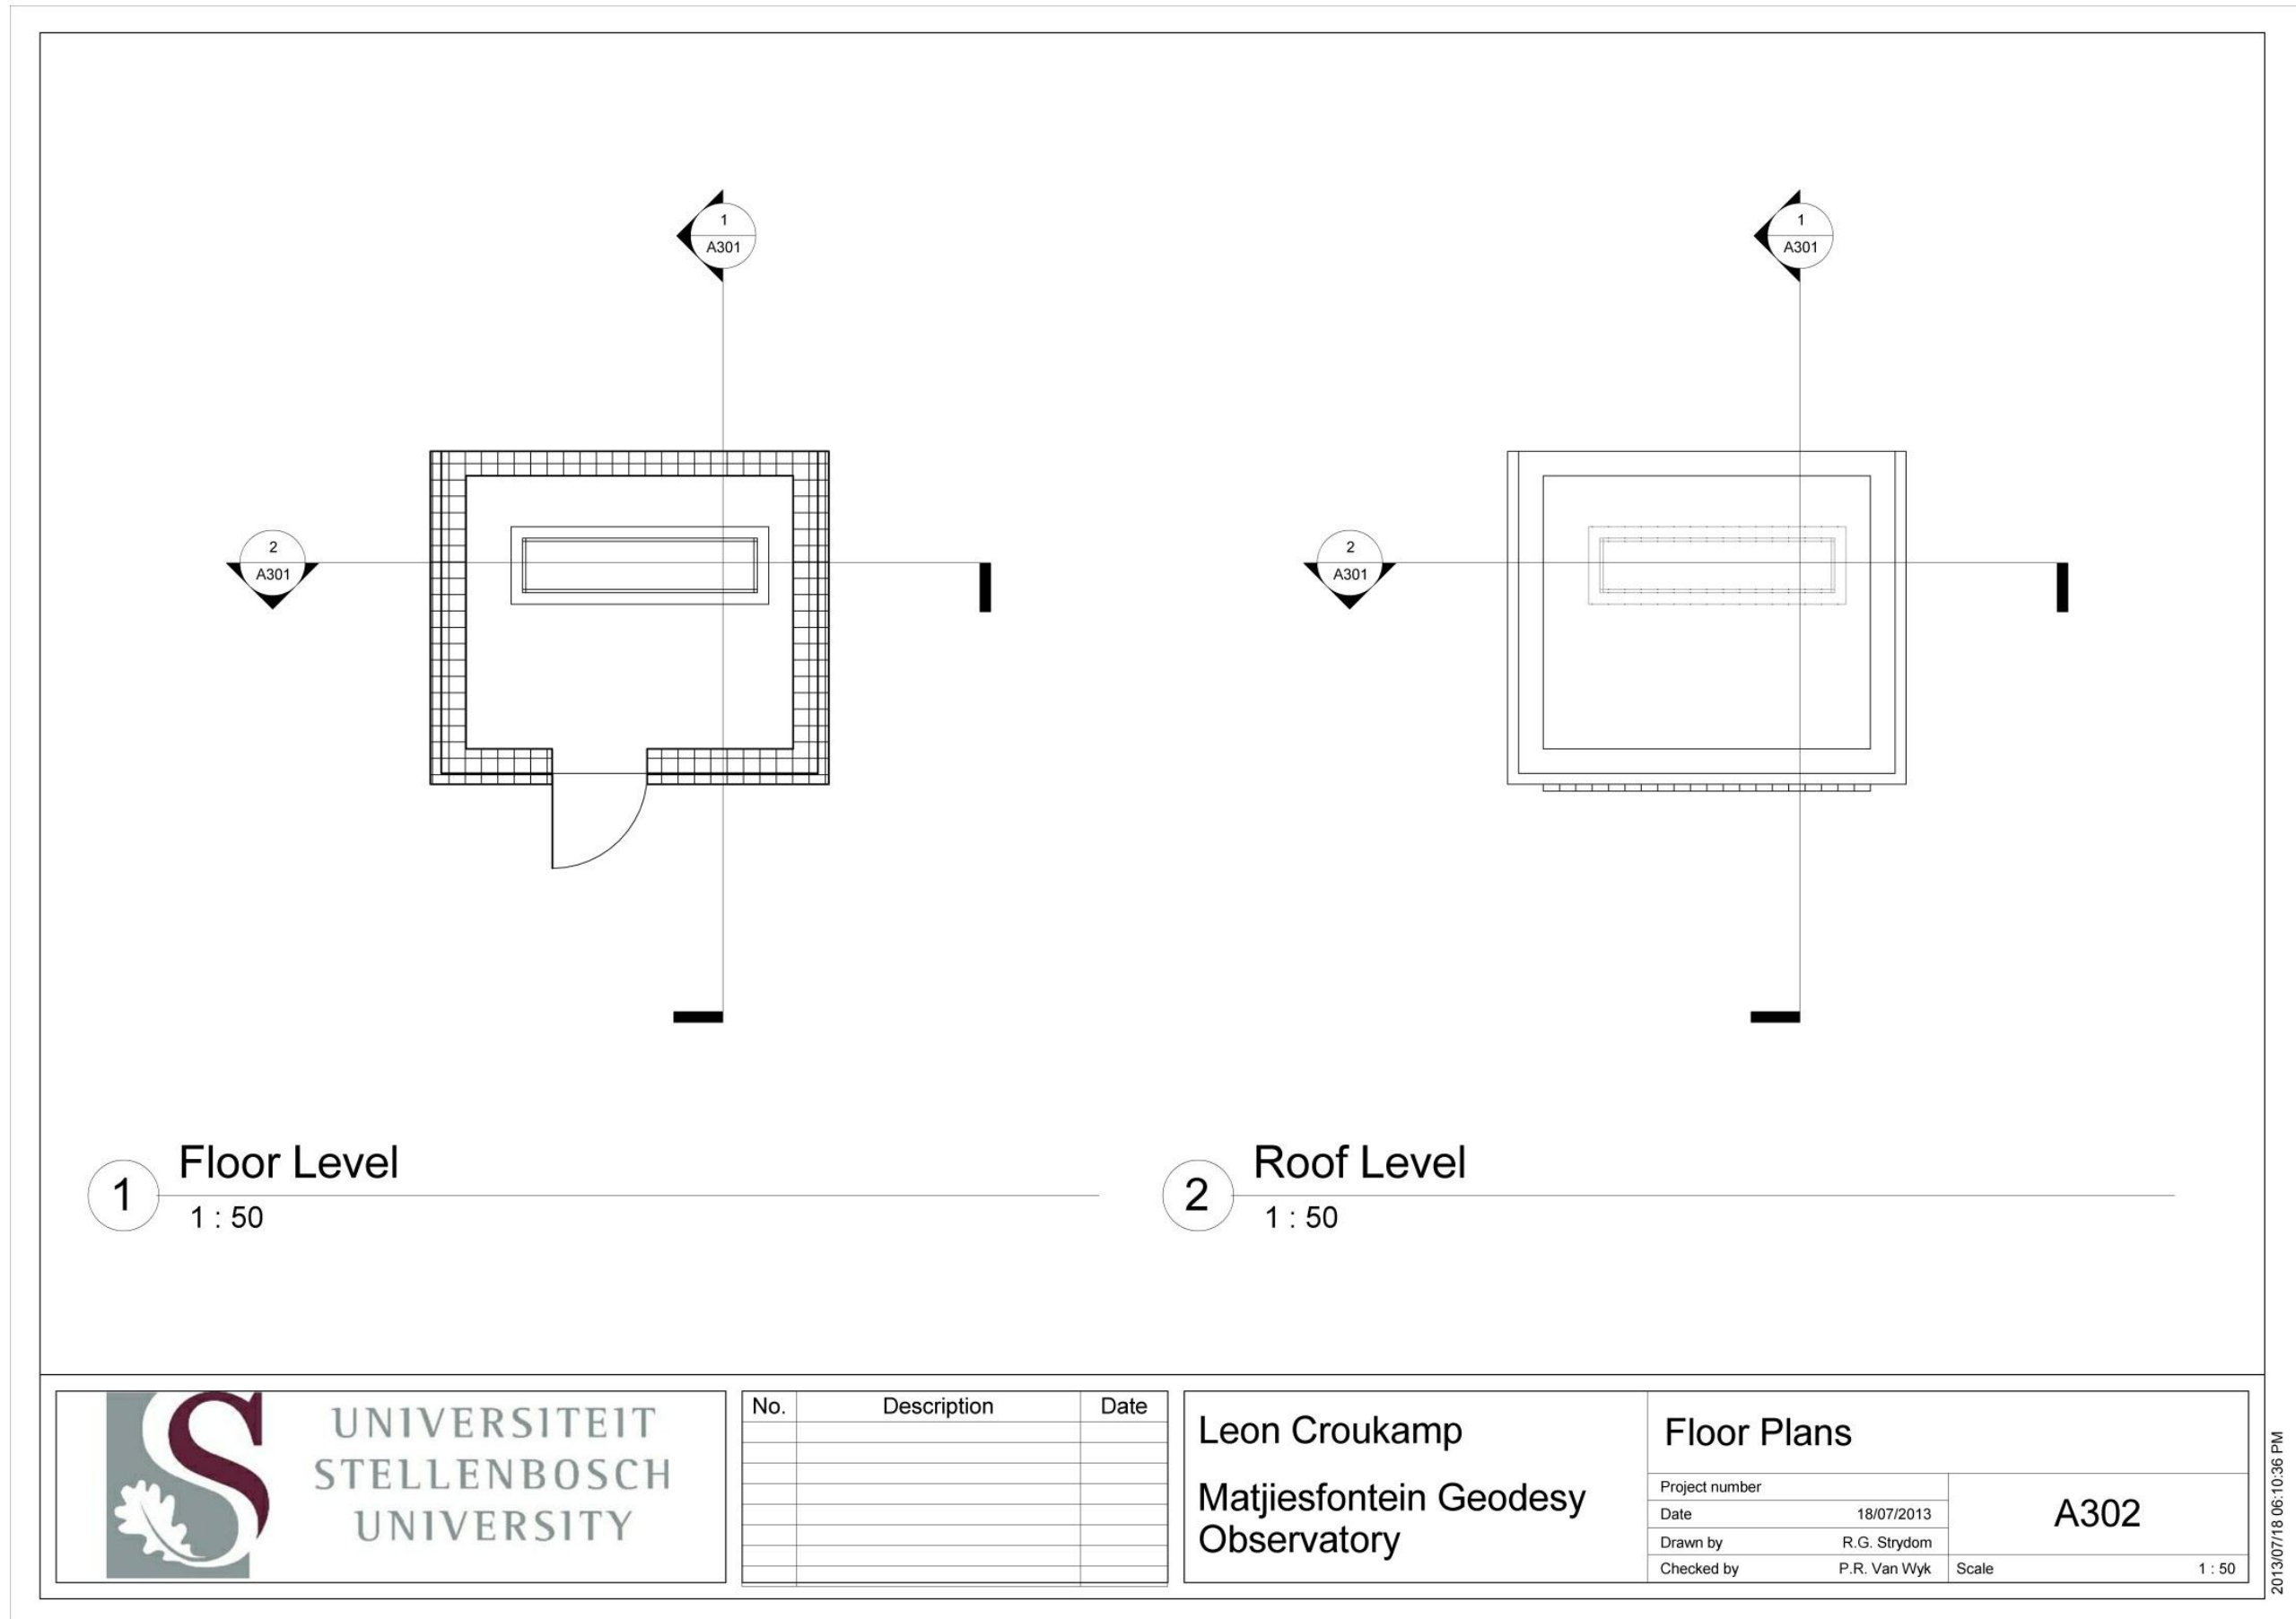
Gravimeter vault design. Floor and roof level view.
